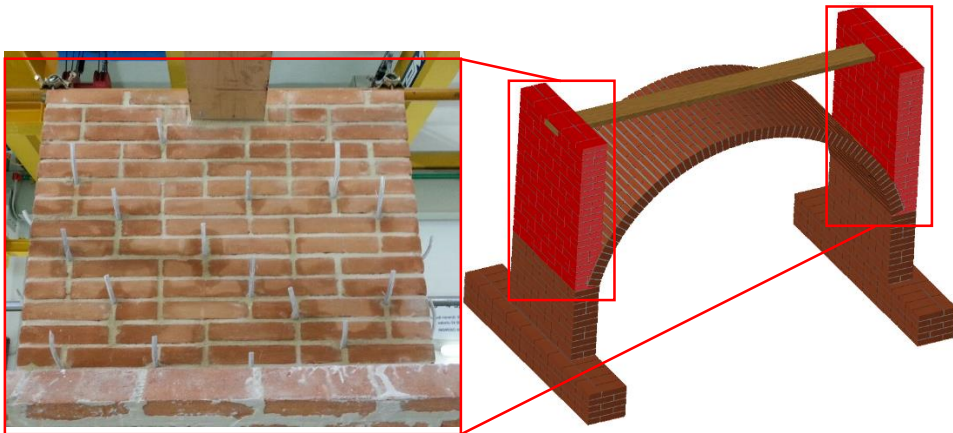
Repointing of the cracked joints and grout injections system on the abutments (higher portion).
